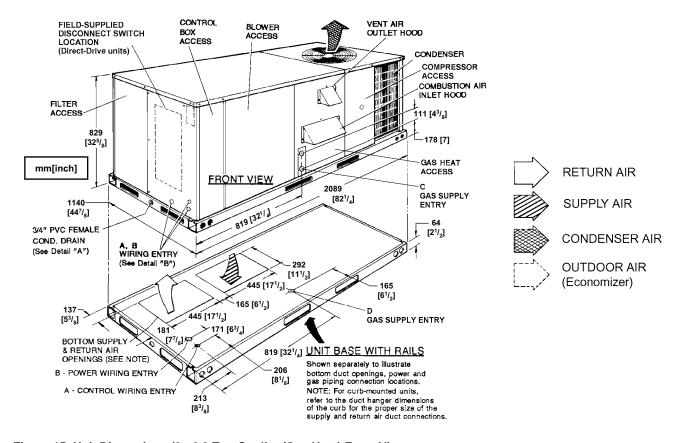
Unit Dimensions (3 - 6.3 Ton Cooling/Gas Heat) Front View
